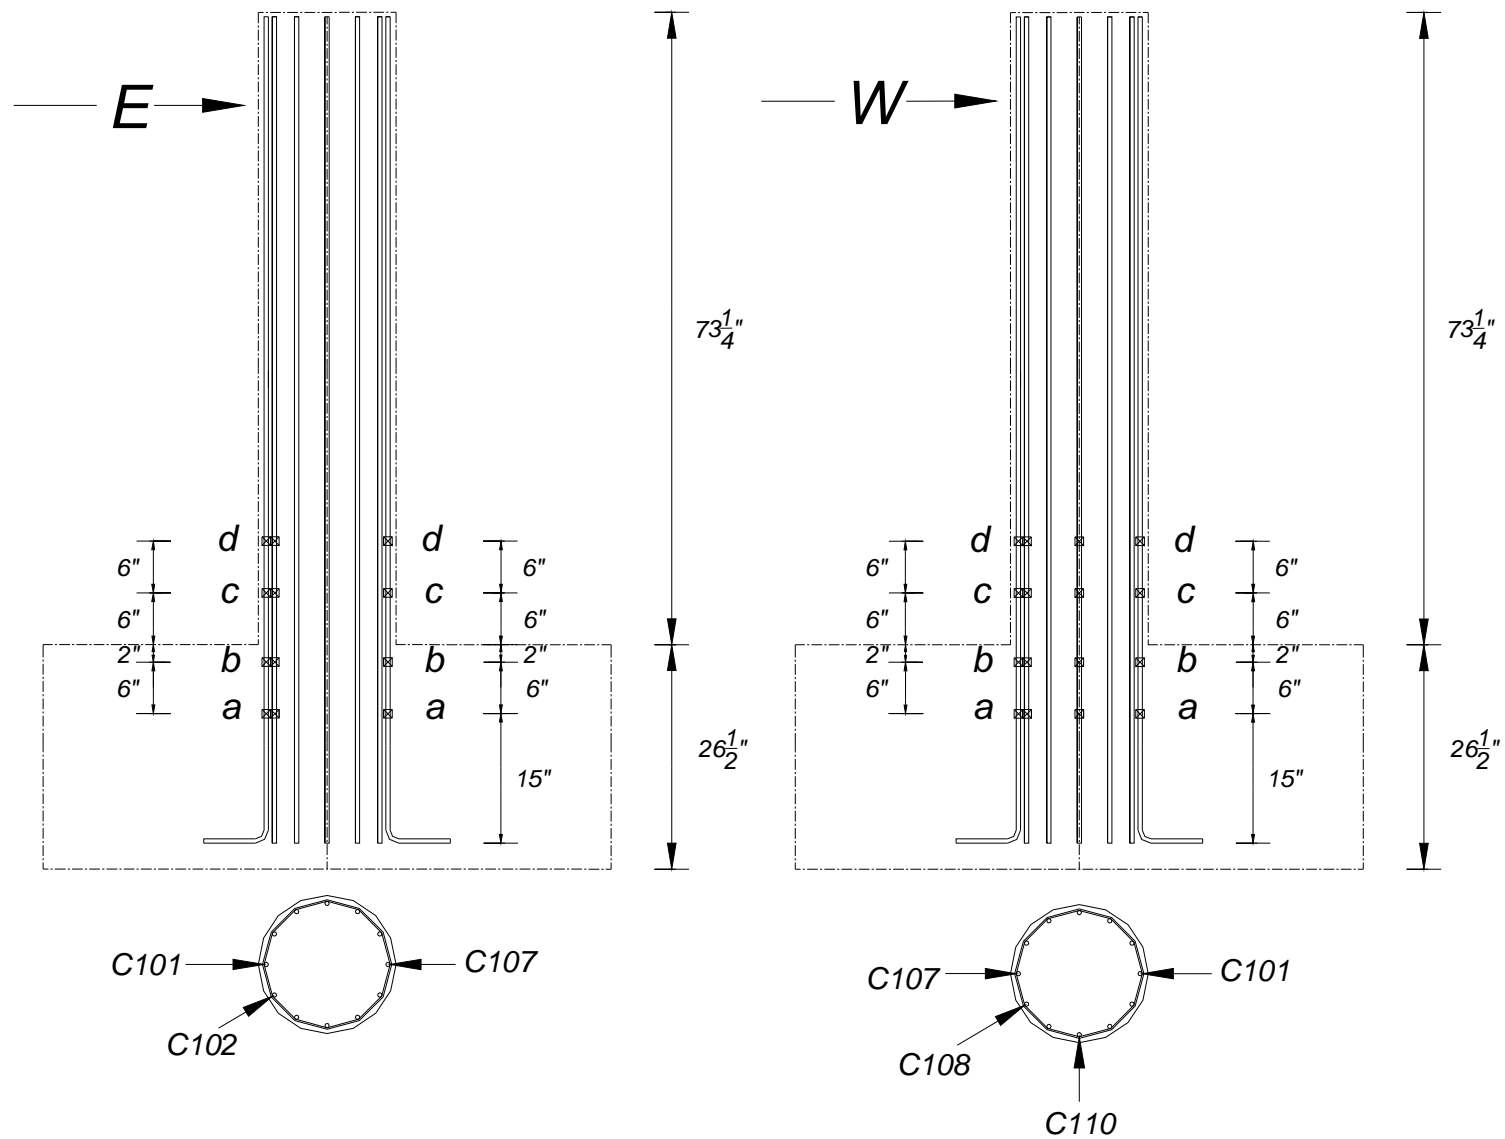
Elevation view of strain gauges location on the longitudinal rebar of TS-1.
